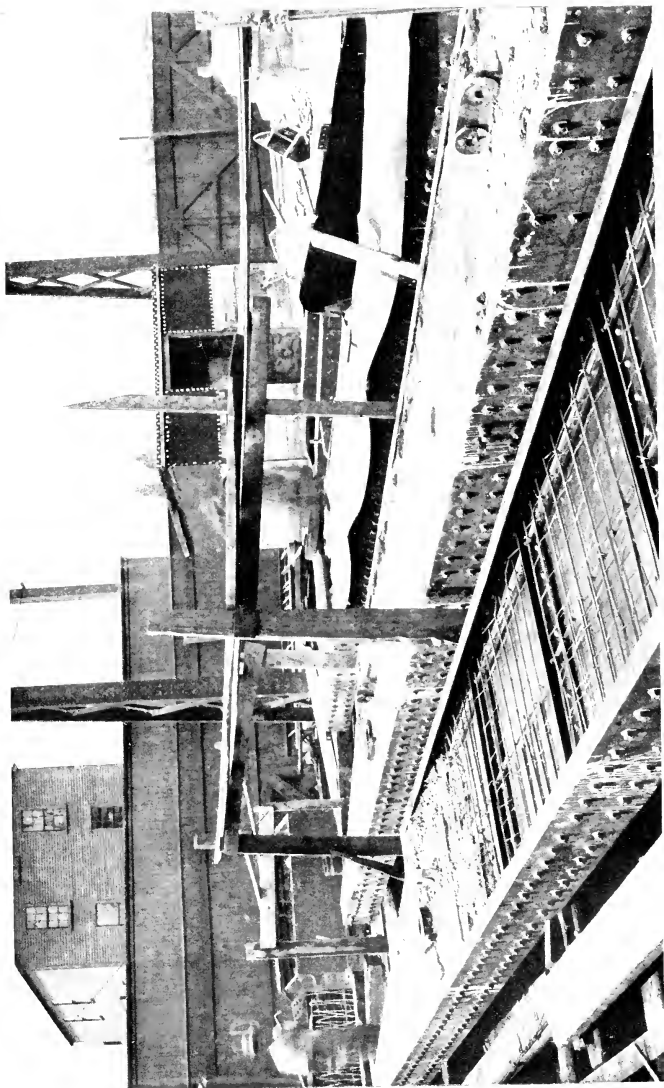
BOYLSTON STREET BRIDGE PLACING CONCRETE PROTECTION ON WEBS OF NEW CITY FLOOR BEAMS.
